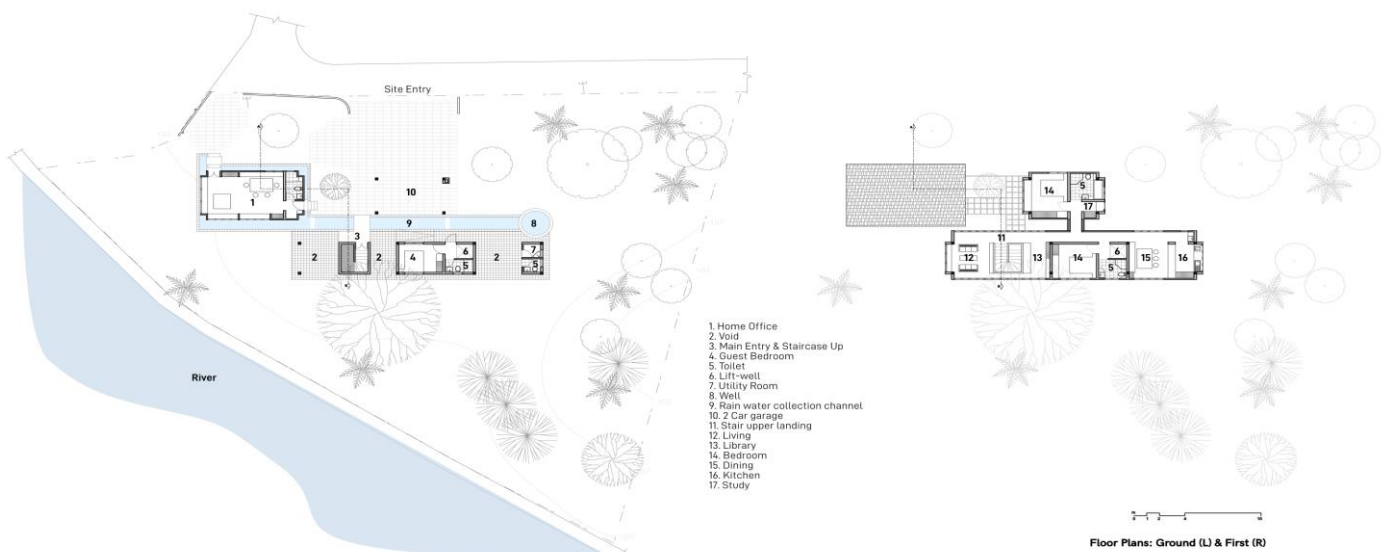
Floor Plans of Garden Terrace House. North facing up.
